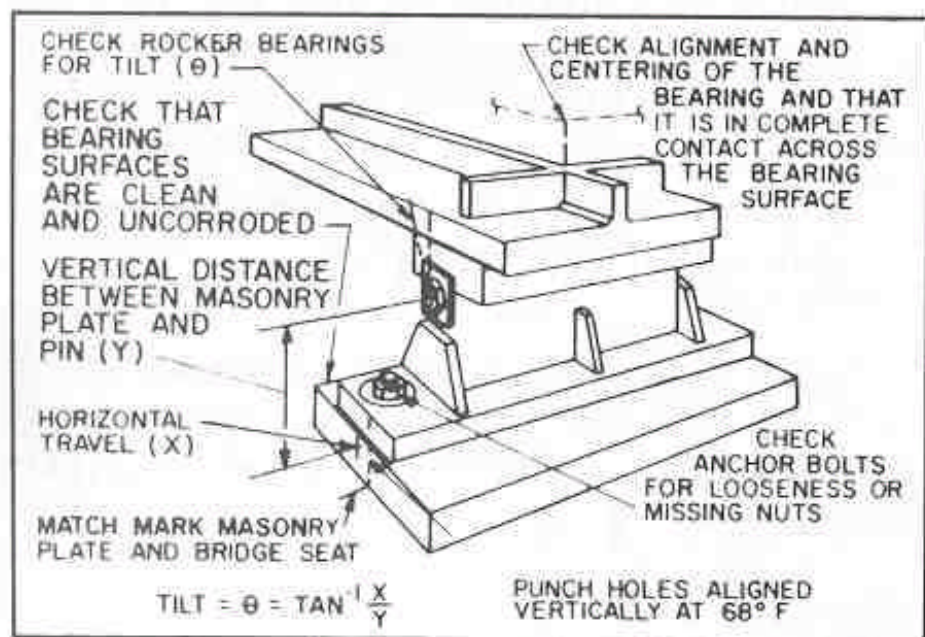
Rocker Bearing Inspection Checklist Items
